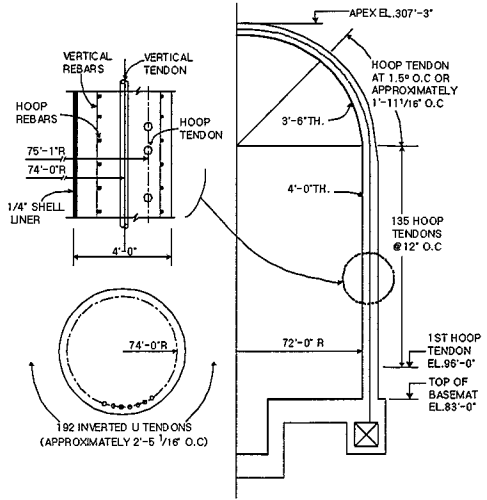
Axisymmetry geometry of Y prestressed concrete containment
